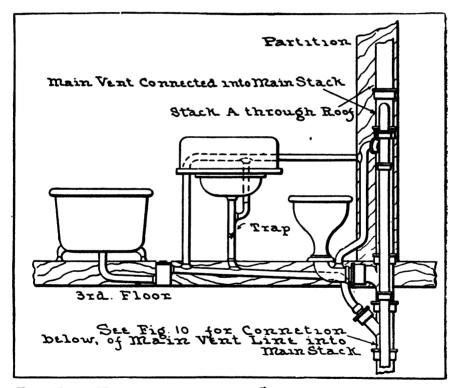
Elevation of Servants' Bath Room - 3rd. Floor.
